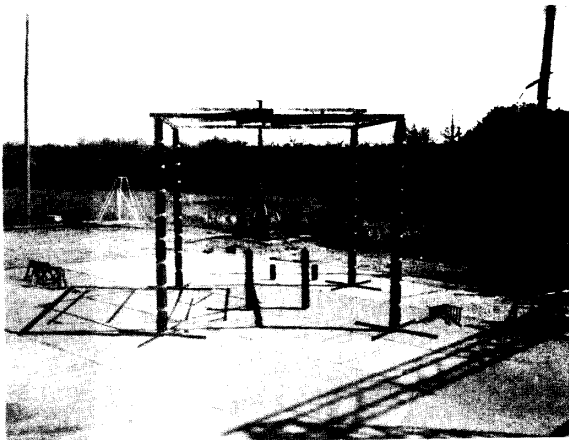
PHOTOGRAPH OF TEST ARRANGEMENT
